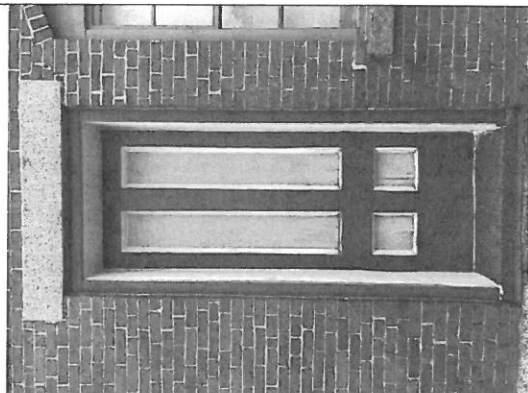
Door A. Detail showing the damaged frame and side panel.
